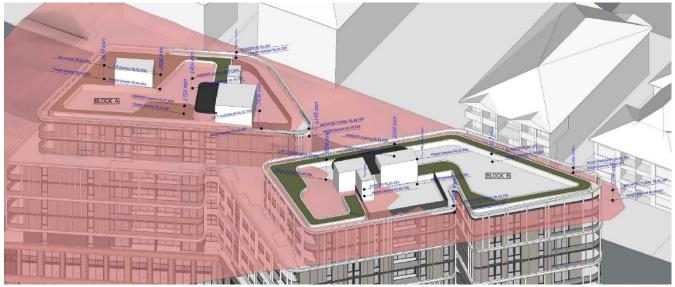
Building Height Plane diagram (Source: PBD Architects)
